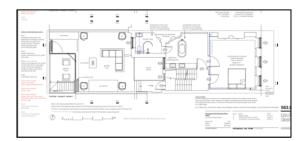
Proposed 1st floor plan of the permitted infill extension at no.34 Great James Street.
